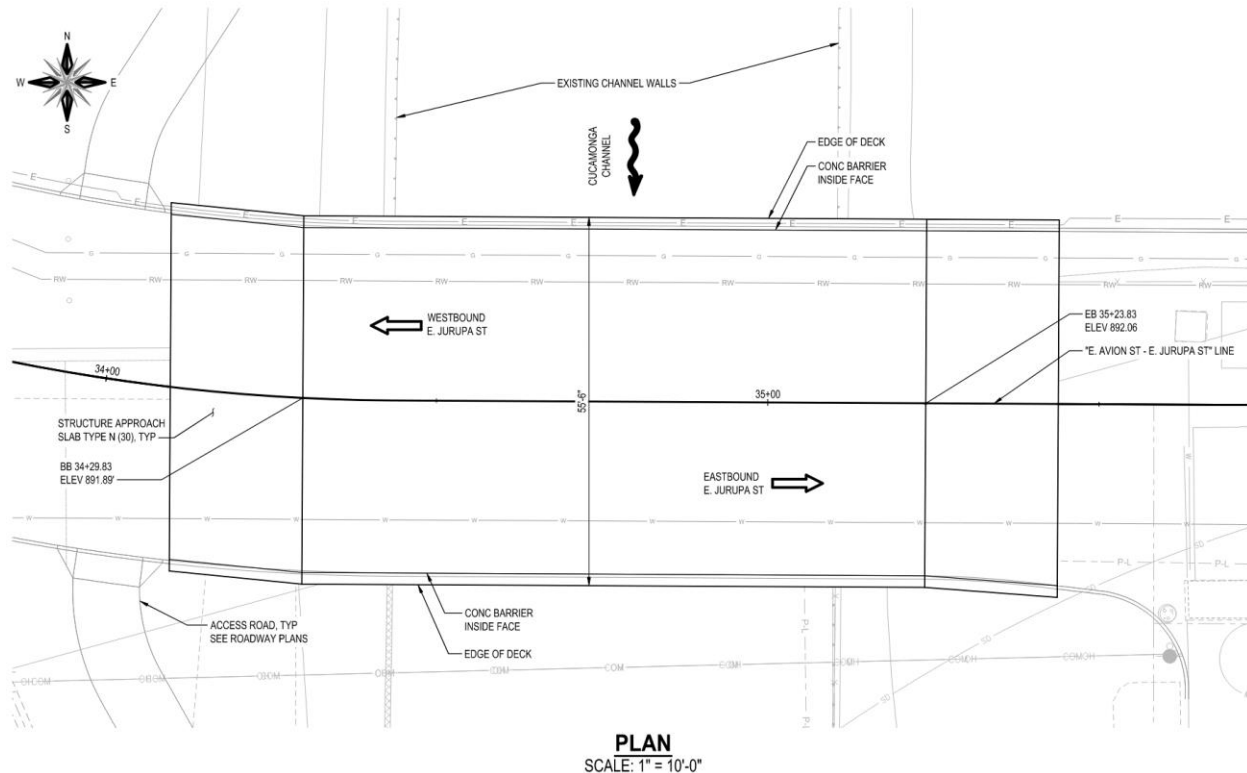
Plan view of the proposed Cucamonga Channel Bridge
